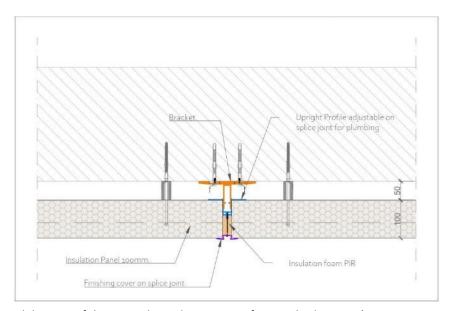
Detail drawing of the vertical panel connection for standard air gap (<6cm, approximately.) [drawing created using AutoCAD]
